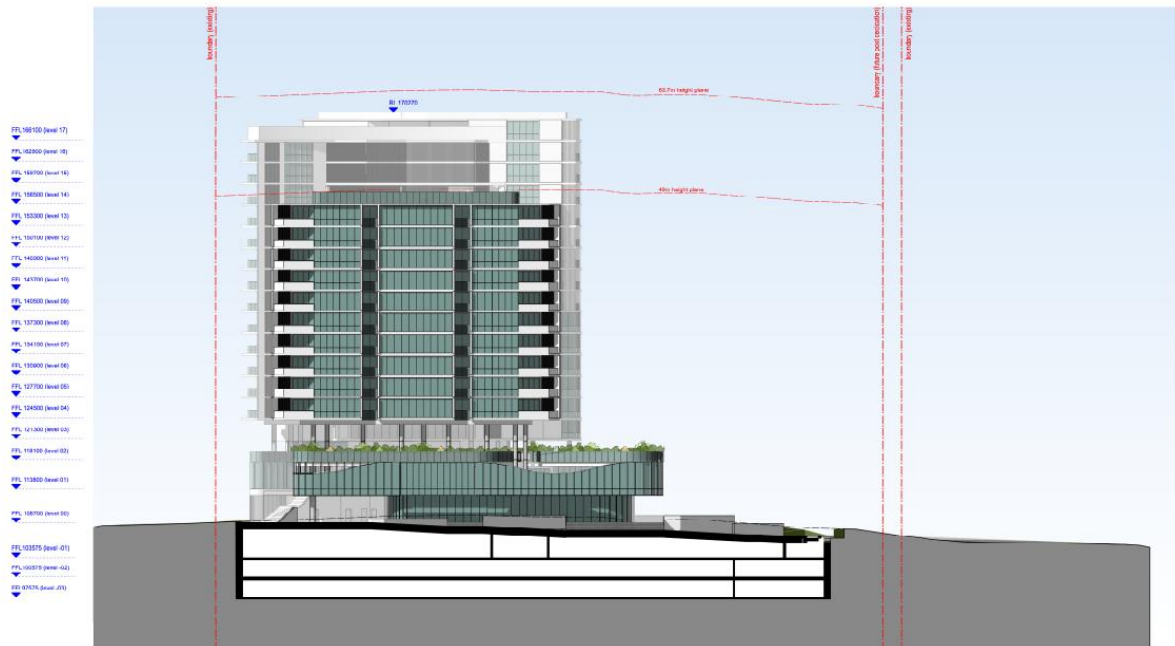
Section showing the mixed commercial and residential tower building that will be constructed, with basement levels visible and the proposed building heights (Source: Kennedy Associates Architects, May 2025, 1804-SD0301)
